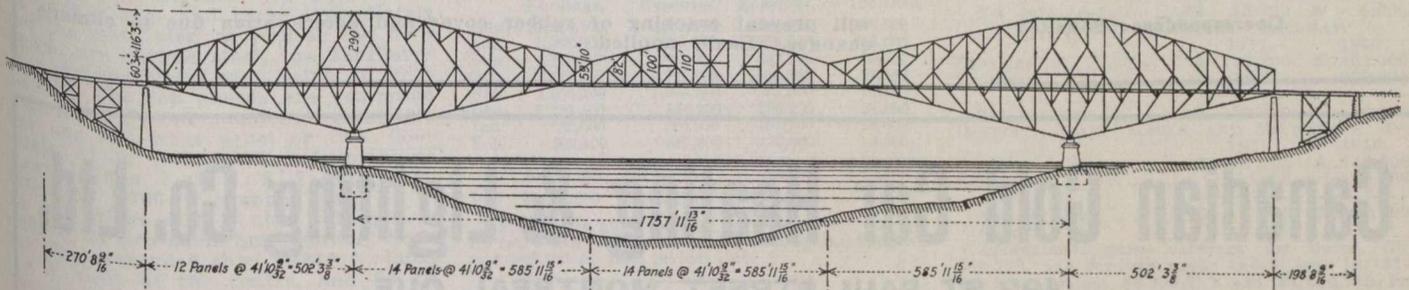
Unaccepted design A-B-X, of St. Lawrence Bridge Co., for Quebec bridge.
